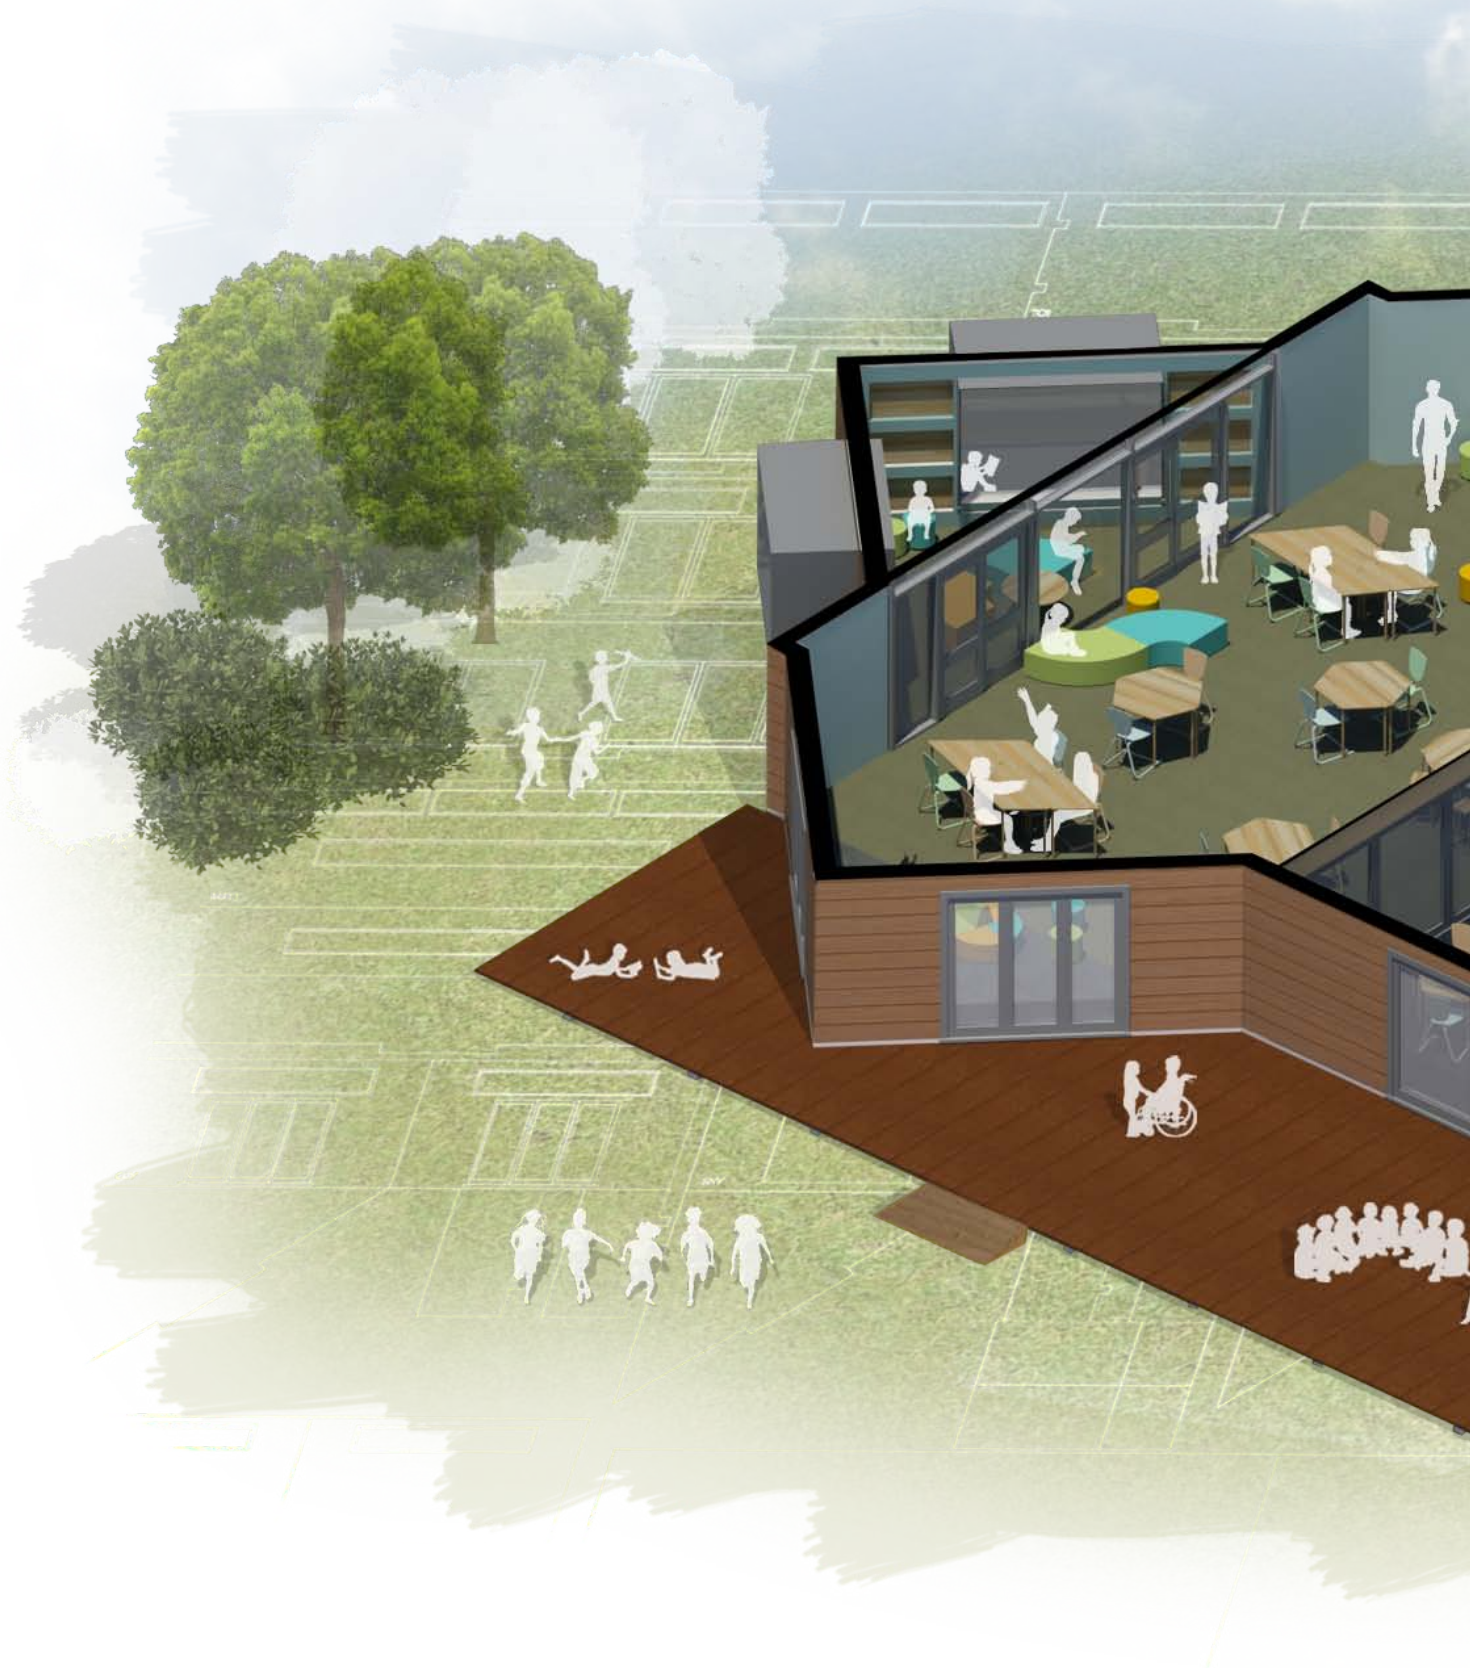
Axonometric plan. Demonstrating the relationship to site during a typical school day.
